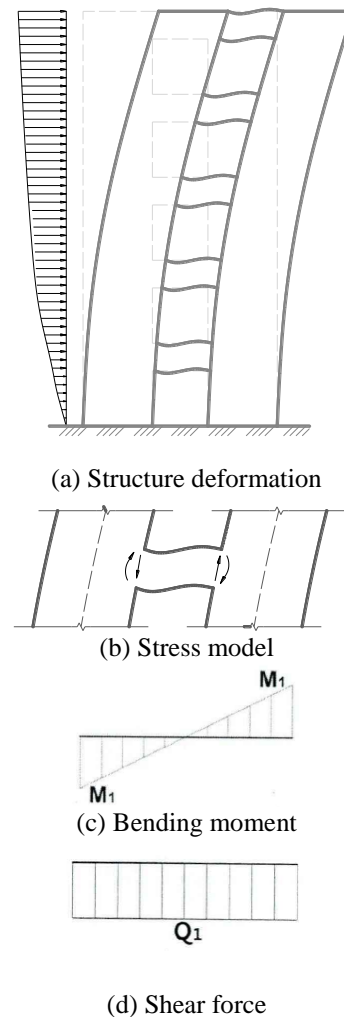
Stress diagrams for reinforced concrete shear wall structure
